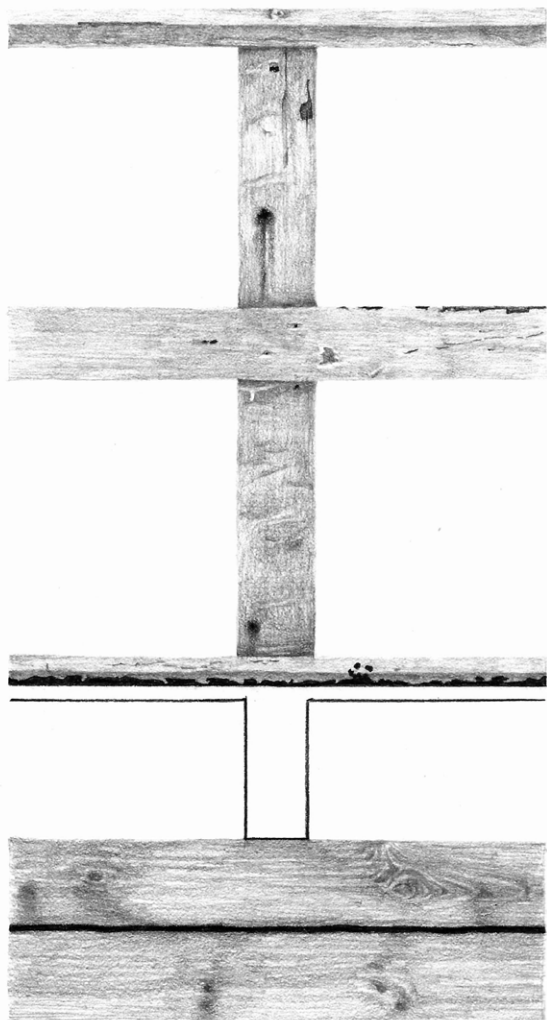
Fence post no. 4 on the north western facade drawn in section, elevation and plan at 1:10. Pencil drawing on cartridge, Gothenburg, March 2025.
